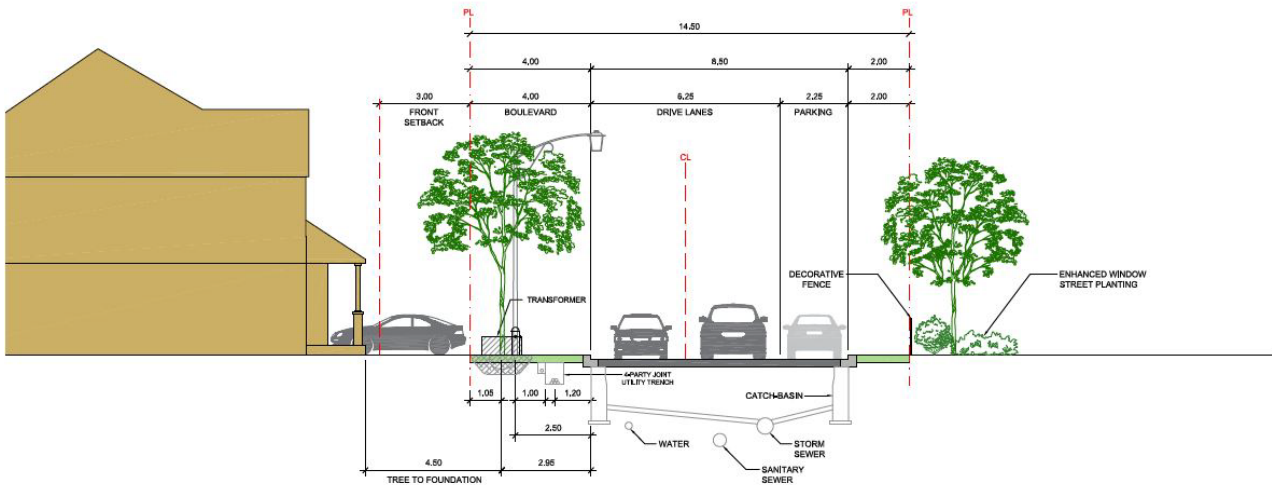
Typical Cross - Section of Window Street (14.5 metres)
